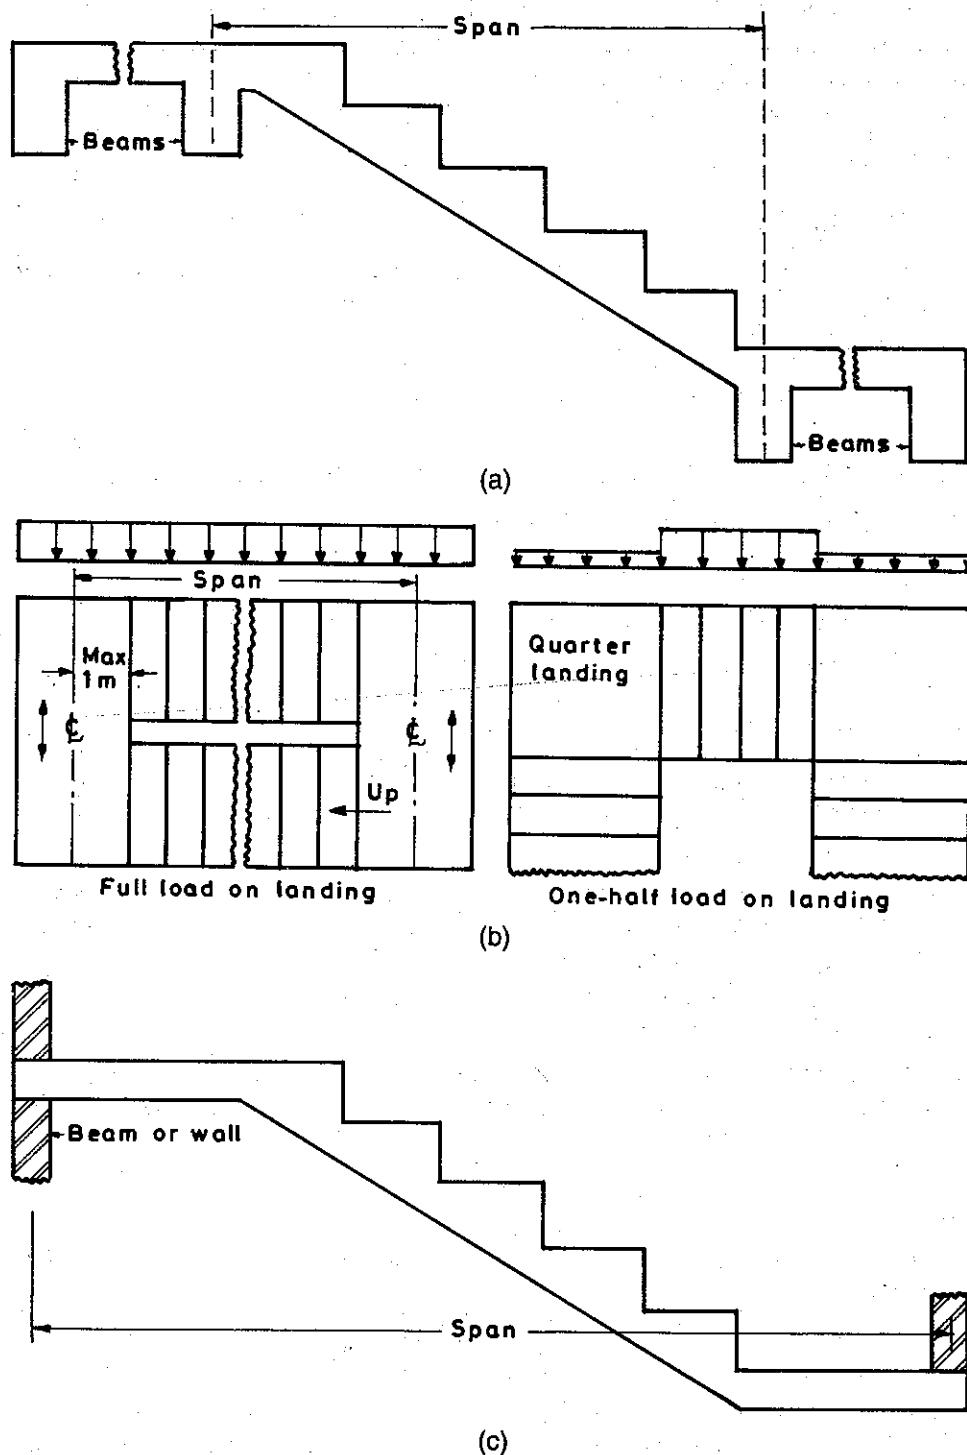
Types of stairs spanning longitudinally: (a) Slab between beams, (b) Slab between landings, (c) Slab between walls.
